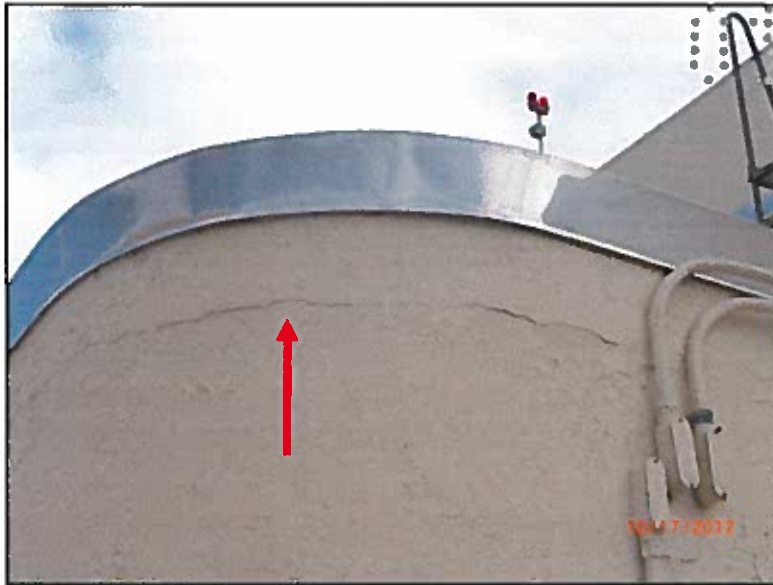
Delaminated/cracking stucco at exterior of Generator Room at roof area
